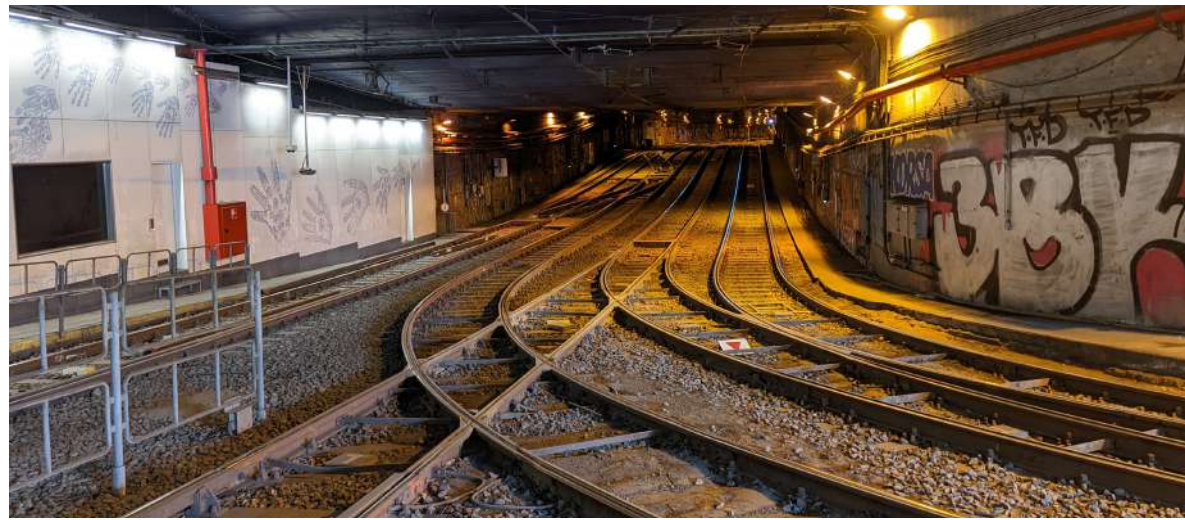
Intersection between the Pre-Metro Tram tracks and the other Tram tracks underneath the street
